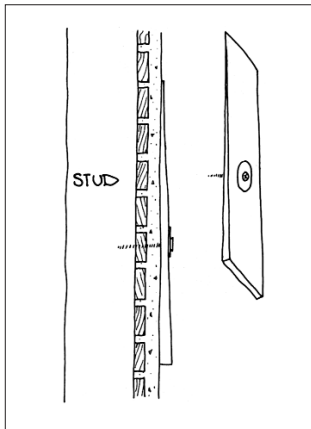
You can draw wall plaster back to the lath with a long drywall screw and a shingle.
